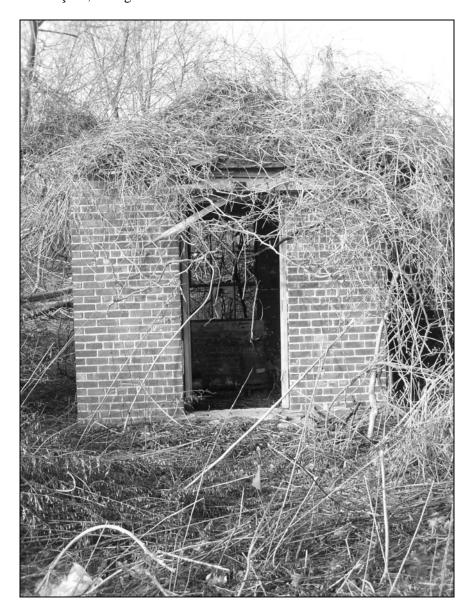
Northern façade, facing south, with open panel above underground vault visible at lower right.
